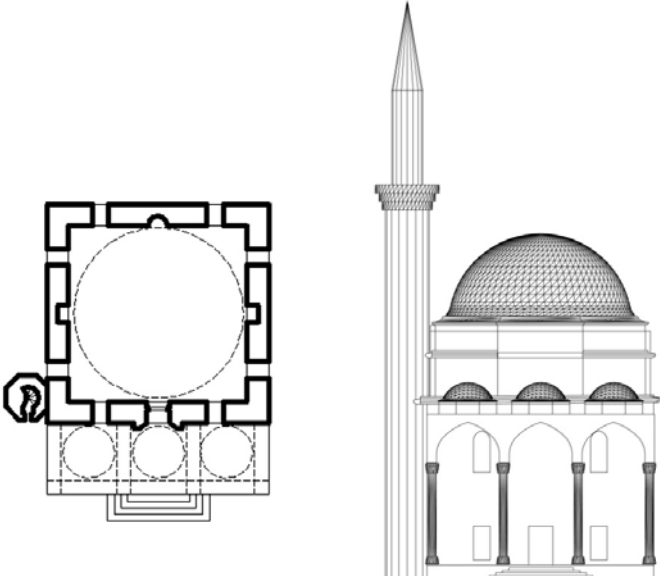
Plan (left) and elevation (right) of the Firuzaga Mosque.
